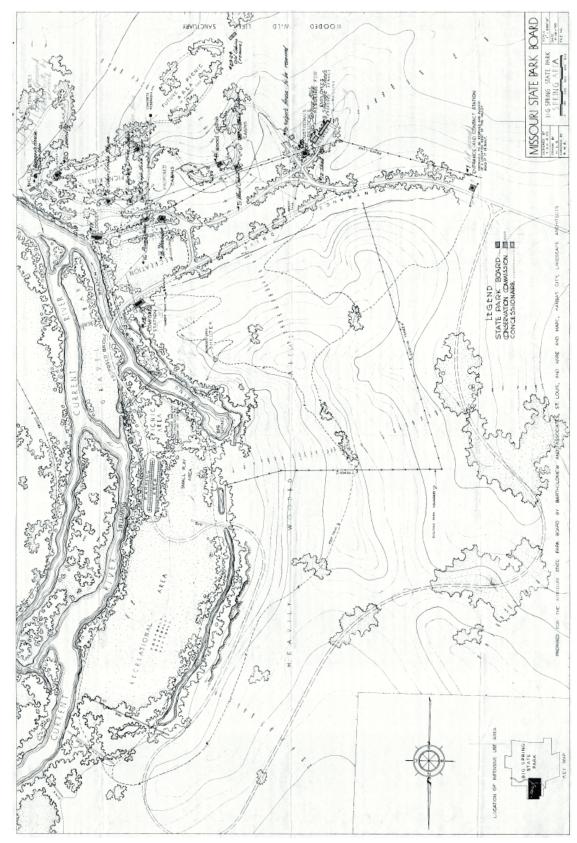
The 1940 master plan proposed a new parking area and shelter at Big Spring. The plans were not realized, 1940. (OZAR Archives)
